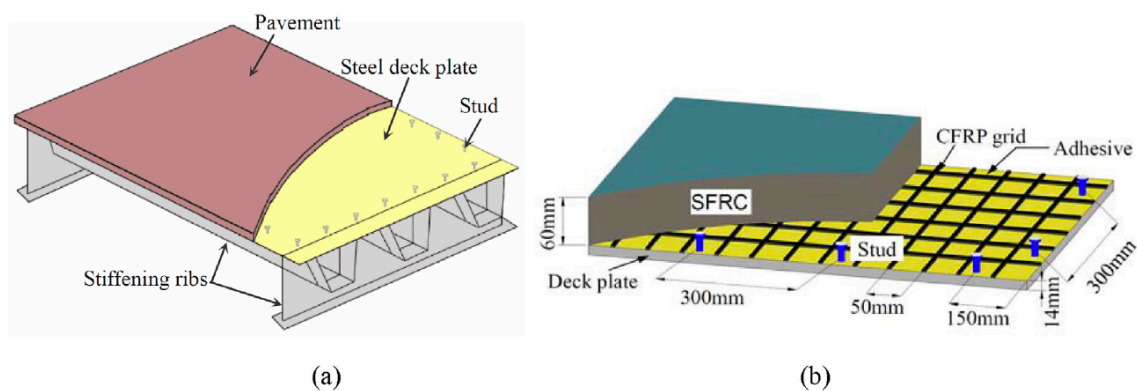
Illustration of a CPCG deck specimen (a) Pavement on an orthotropic steel bridge deck and (b) CPCG deck specimen with different components (Fang et al. 2017).
